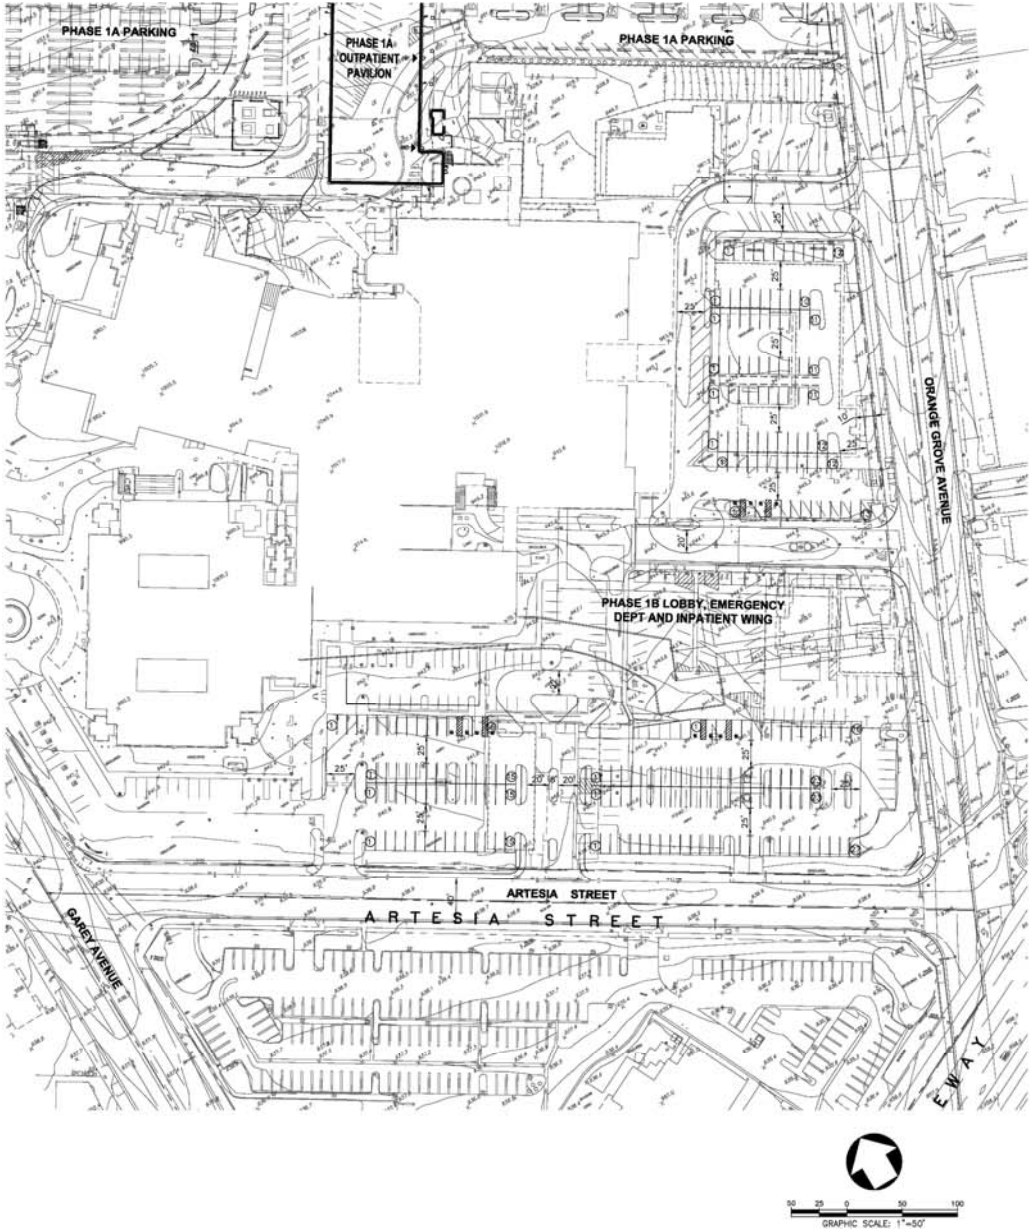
Phase 1A Conceptual Parking Plan
